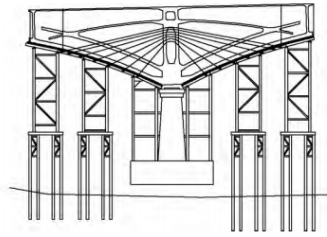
Schematic Diagram of Joint Construction of Cable and Framing.
